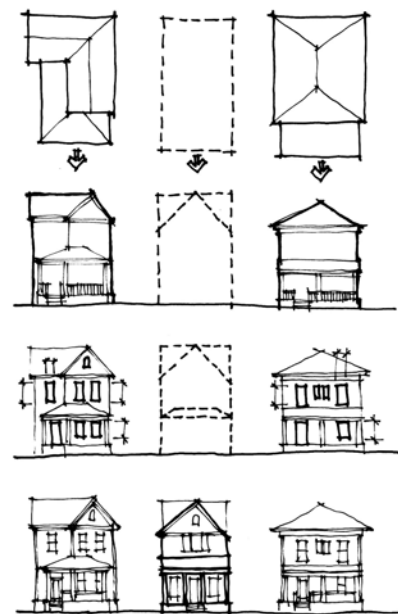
Overall Height, building element height and proportion/shape should be compatible with existing structures.
